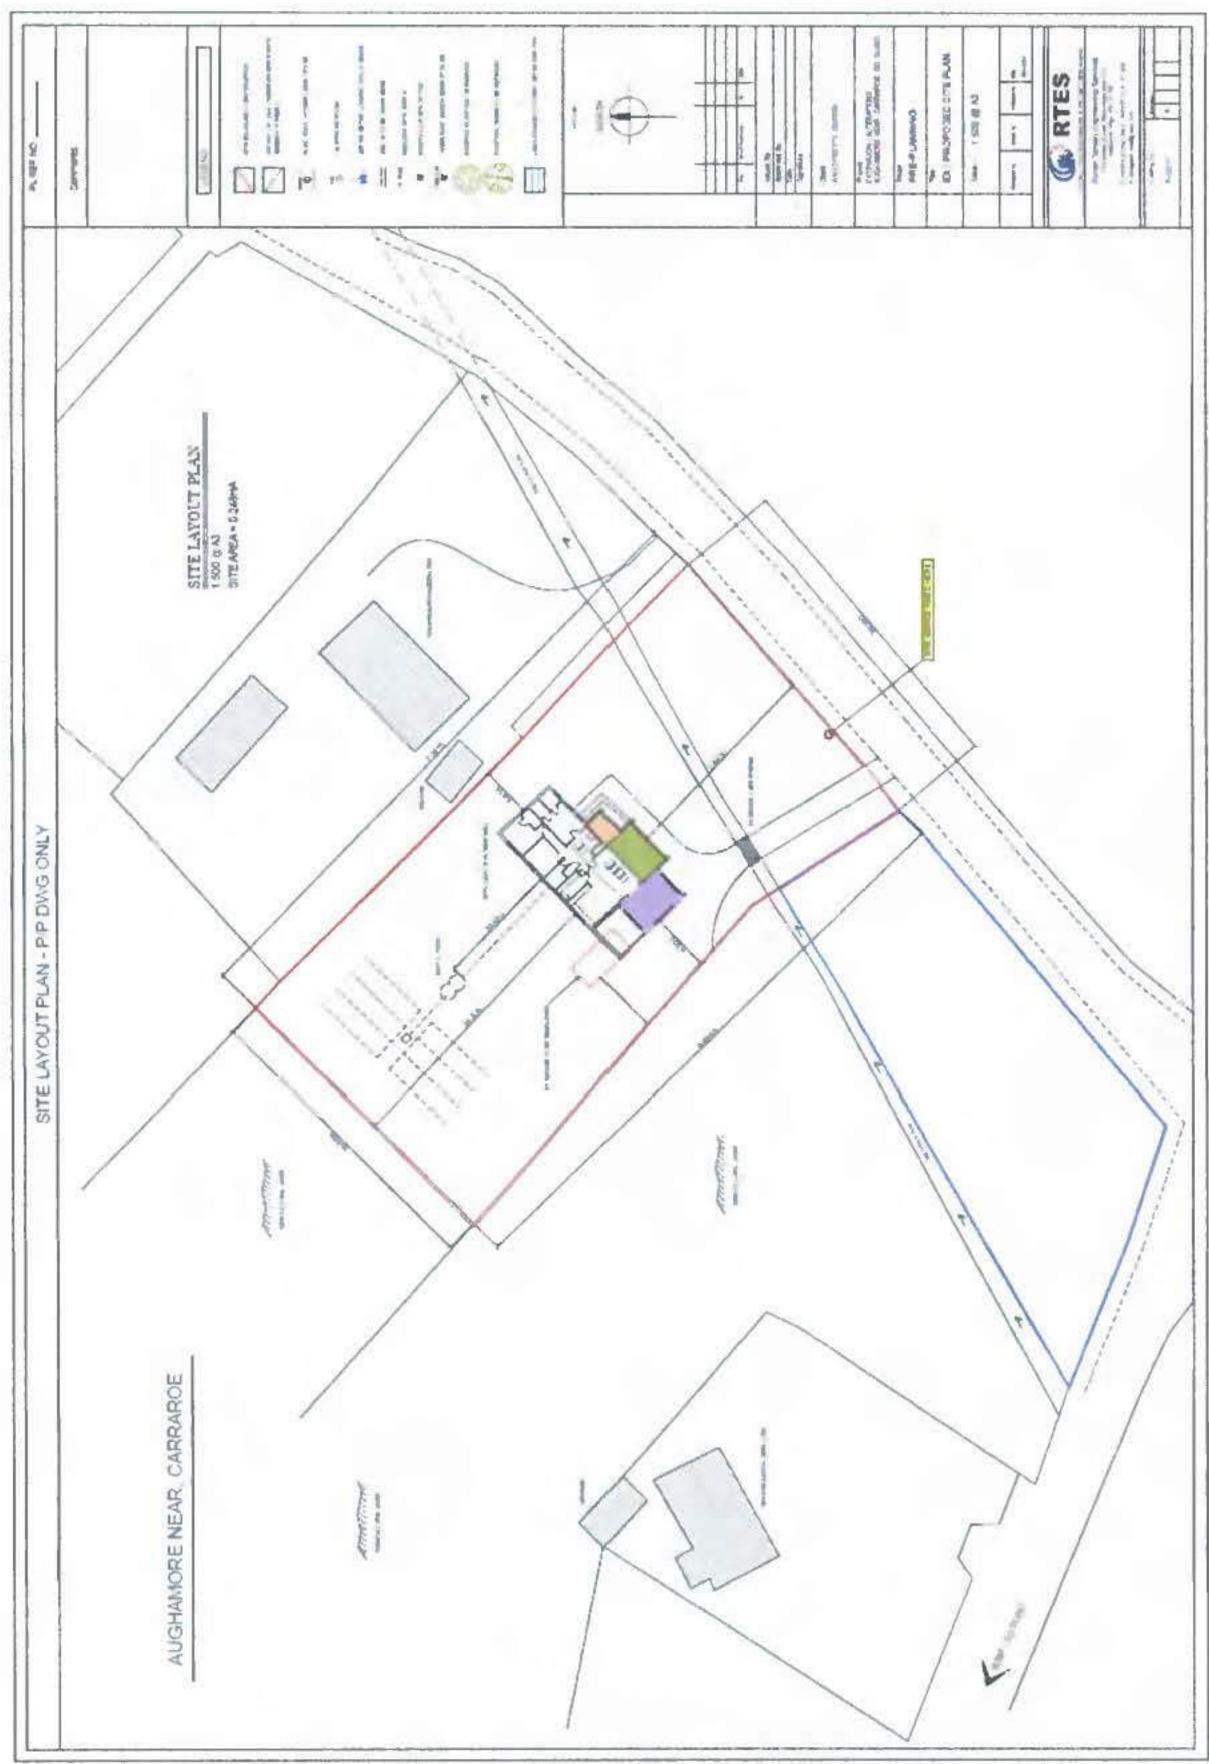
Proposed Site Layout Plan of Development at Aughamore Near
